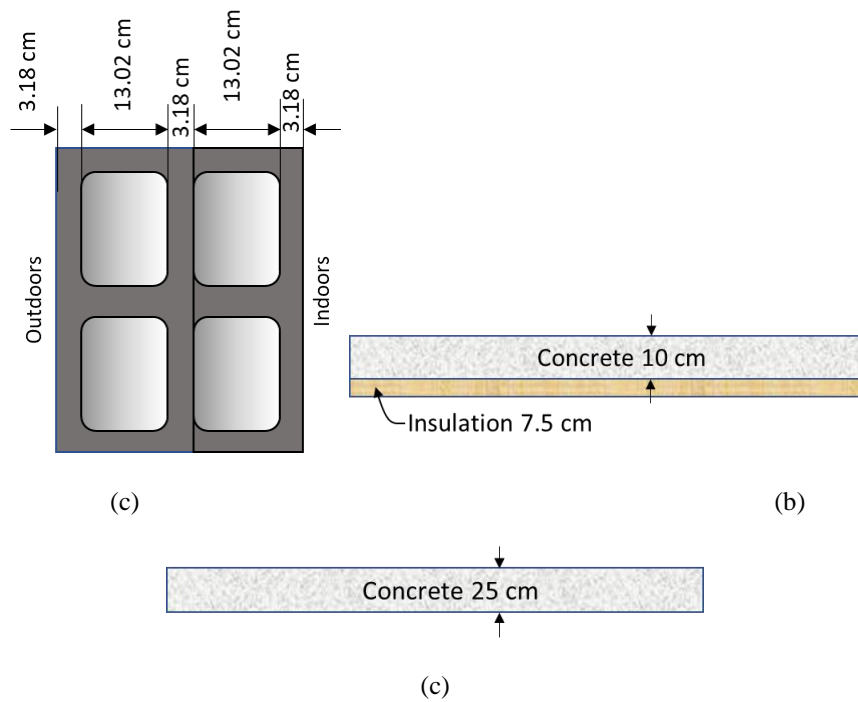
Building envelope details of (a) vertical walls, (b) Roof and (c) ground floor.
